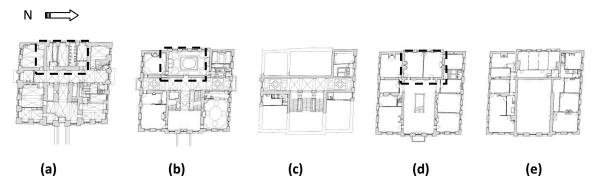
The floor plans of the building; (a) basement (b) ground floor (c) mezzanine floor (d) first floor (e) second floor. The dashed line boxes indicate the selected zones for the simulation exercises and where the red box in (b) shows the Grand Salon, the focus of this pilot study.
